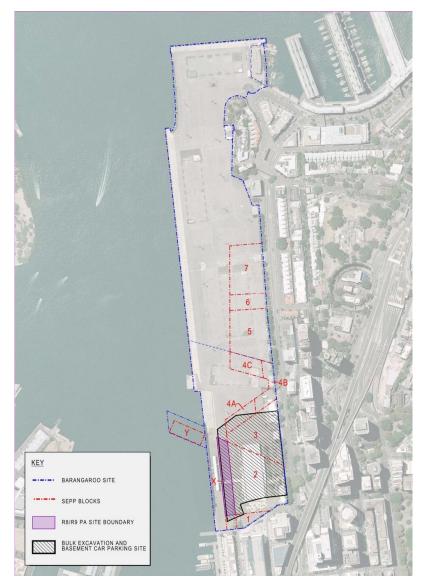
R8 and R9 Residential Building Project Application (MP11\_0002) Aerial Site Location Plan
